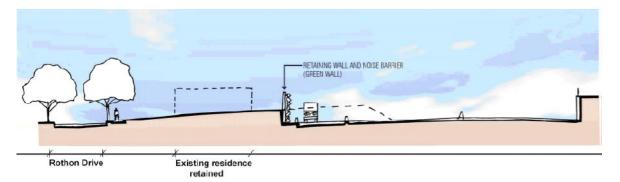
Typical cross-section through Precinct 1 — Strategy 2
